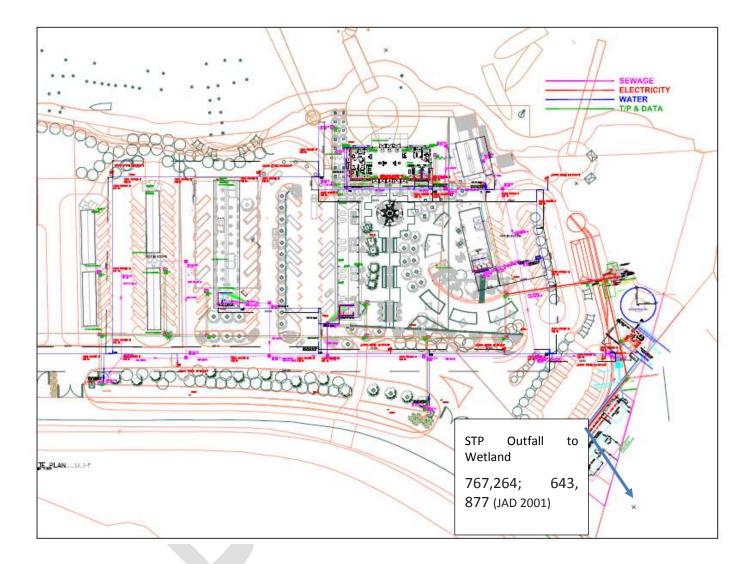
Old Coal Wharf – Site Layout Showing Sewage Outfall.
